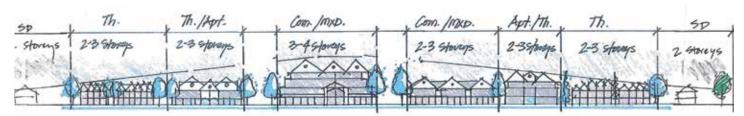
Transitioning concept of building heights and massing from Village to lower-density areas
